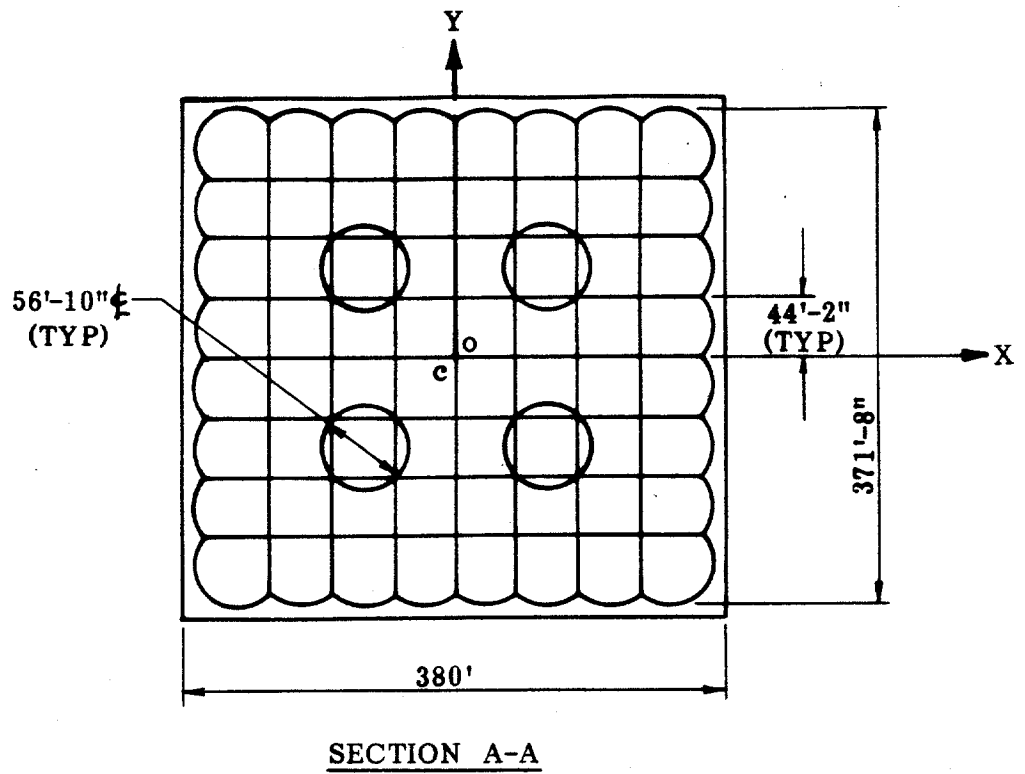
CONCRETE GRAVITY PLATFORM LAYOUT, 300 FT WATER DEPTH
